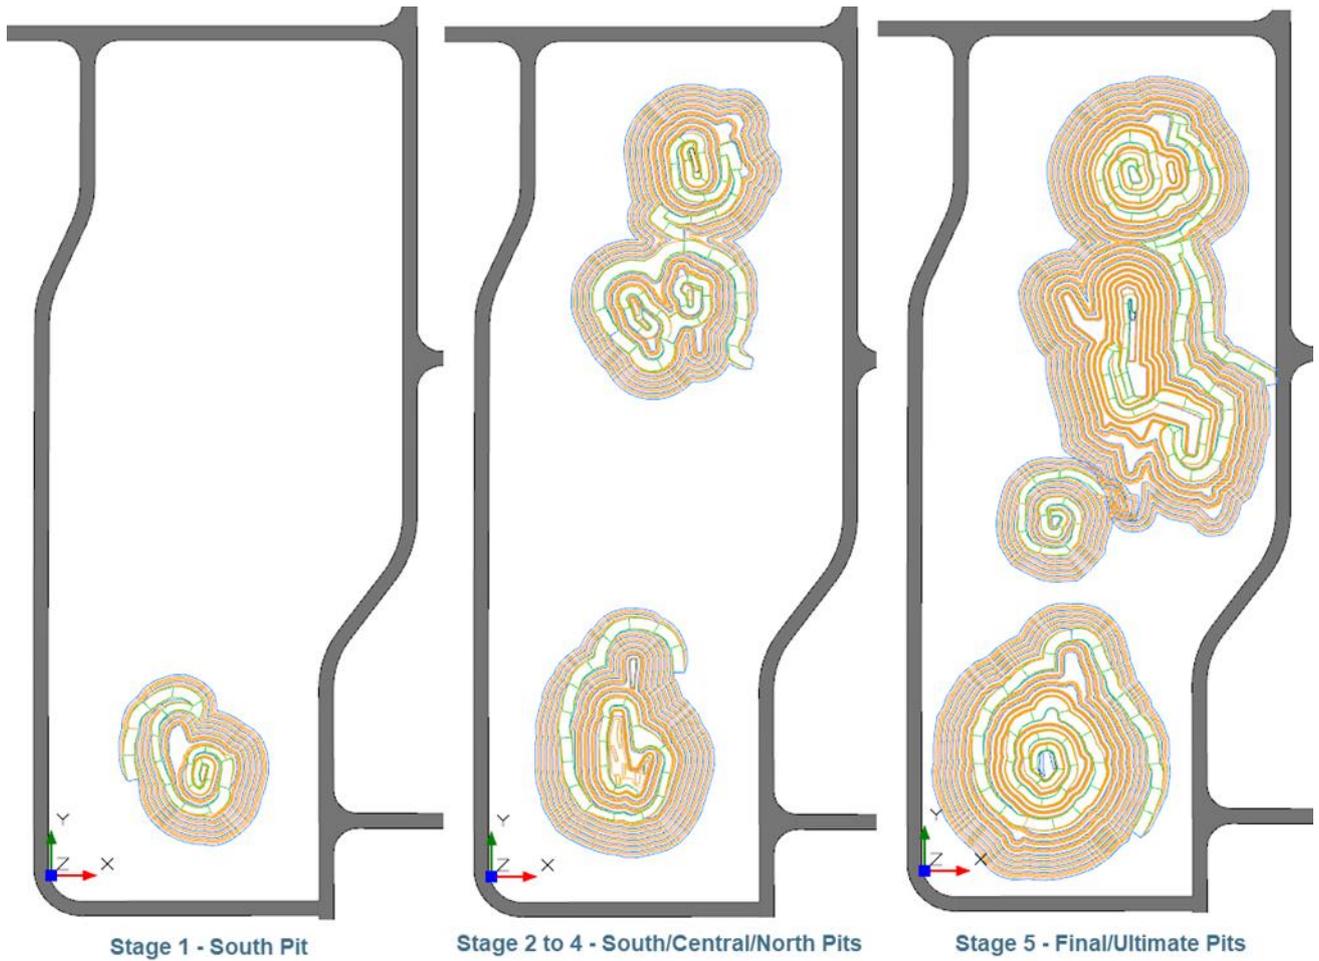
Plan showing 5 stage open pit design for Turnberry.
